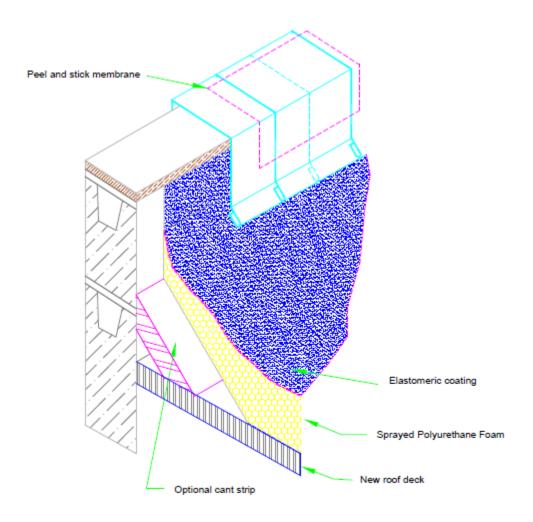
TYPICAL ROOF EDGE WITH GUTTER
